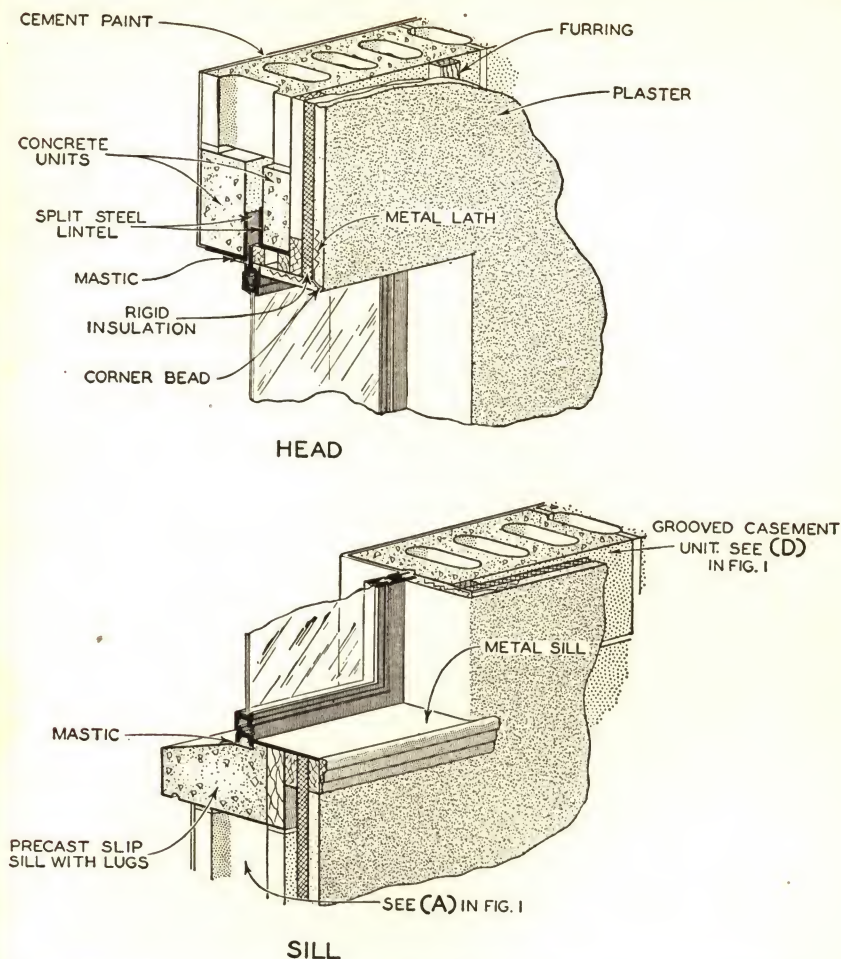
Swing-Out Type Steel Sash Casement Window in Concrete Masonry Wall
